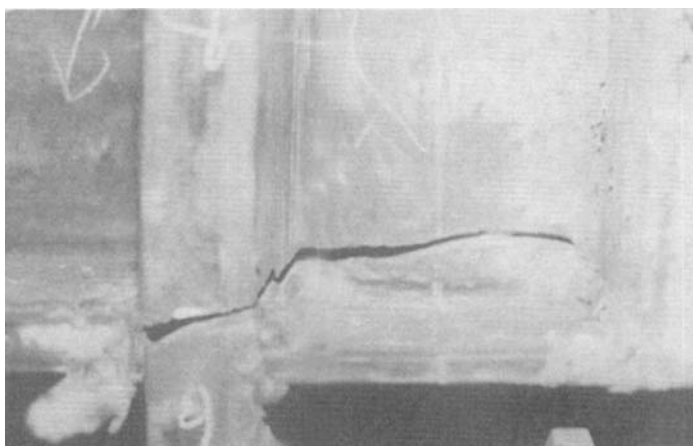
Typical beam-column connection fracture observed following the Northridge earthquake. Photograph courtesy of EQE International
